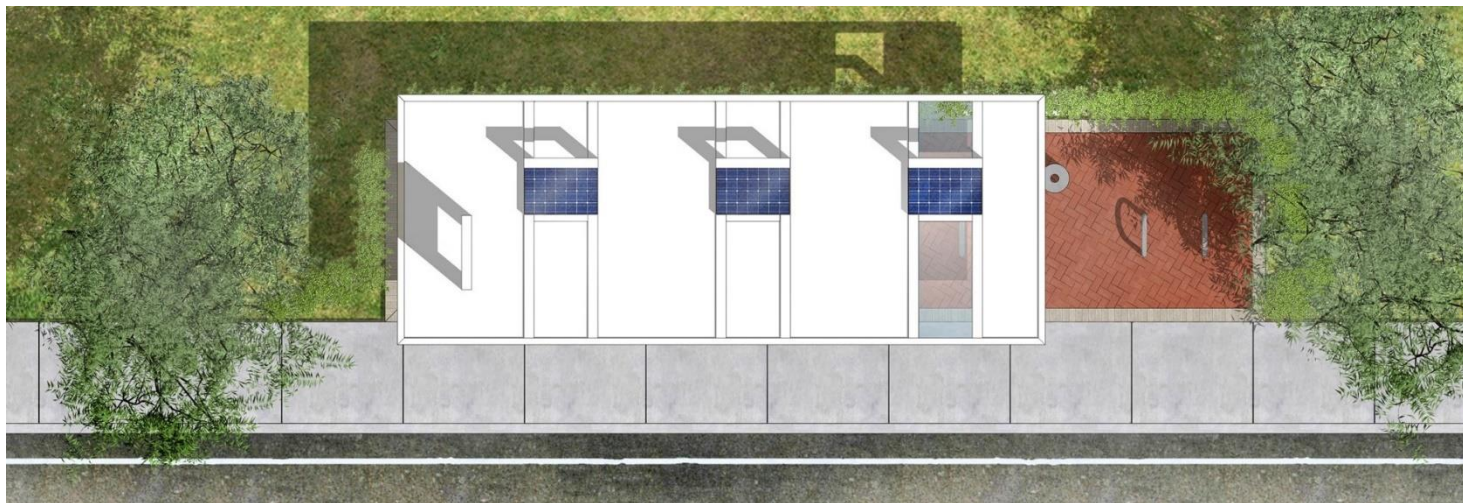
TRANSIT STOP TYPE 4 – LARGE-SCALE SHELTER (PLAN VIEW)
